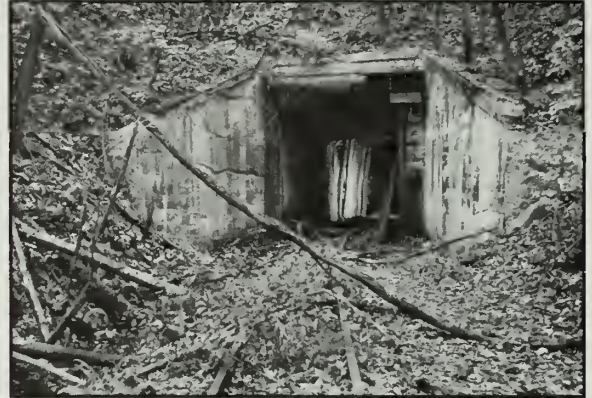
Sideling Hill tunnel, east portal. Photo by Jack E. Boucher.
